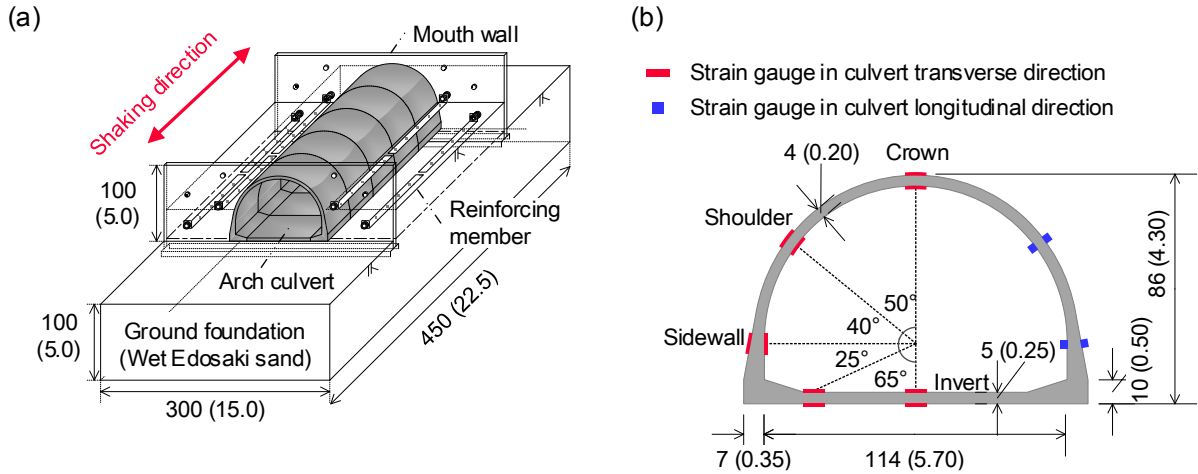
Schematic drawings of (a) embankment model with culvert and (b) arch culvert with strain gauges.
